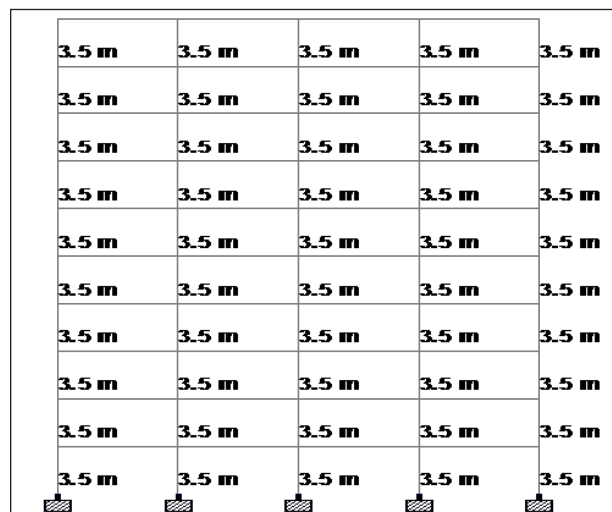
Structural Framing Elevation of the Proposed 10 Storey Steel Building
